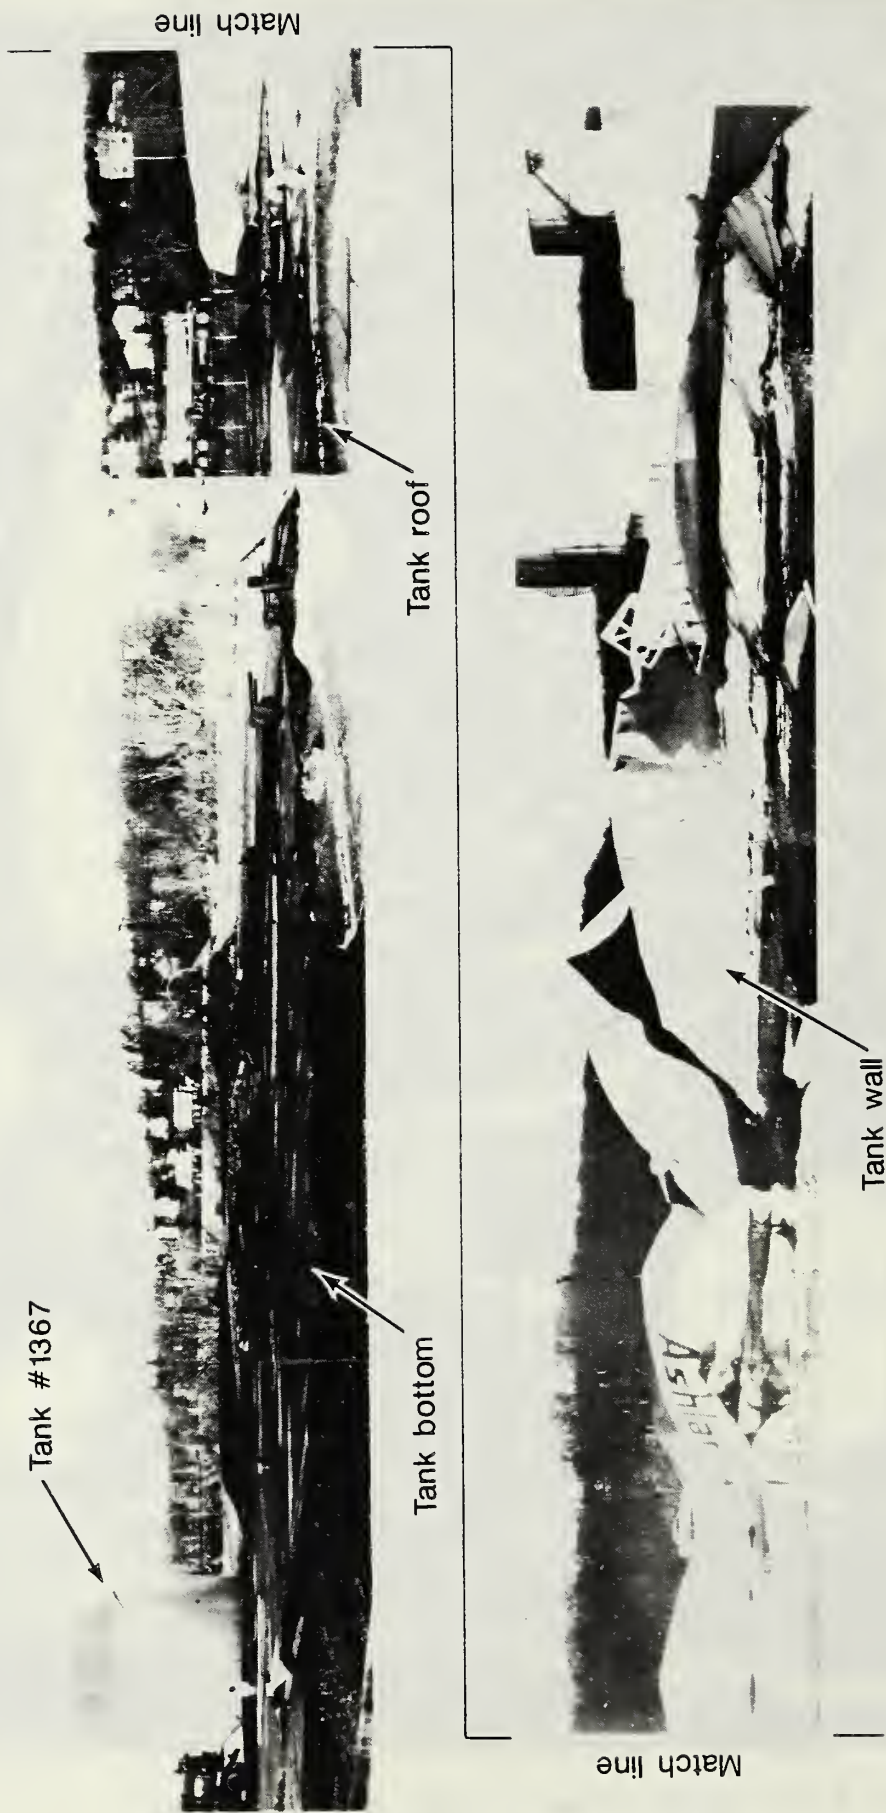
View of Collapsed Tank No. 1338 from Ground Level
